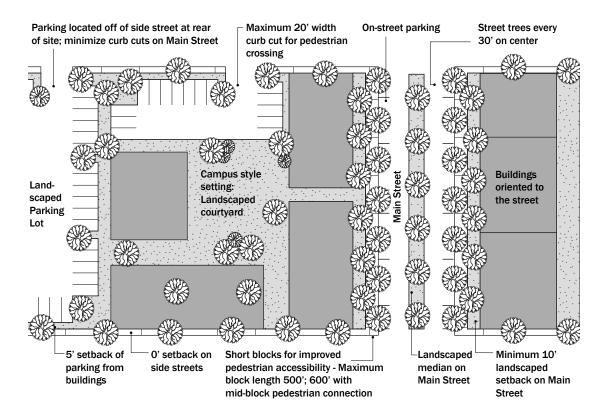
Downtown Mixed Use: 3rd and 4th Street Enhancements
